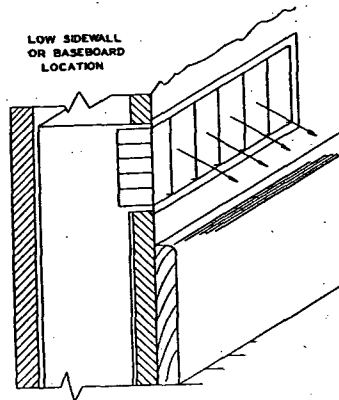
RECOMMENDED TYPE OF BASEBOARD AND LOW SIDEWALL INSTALLATION ON WARM WALL^a
